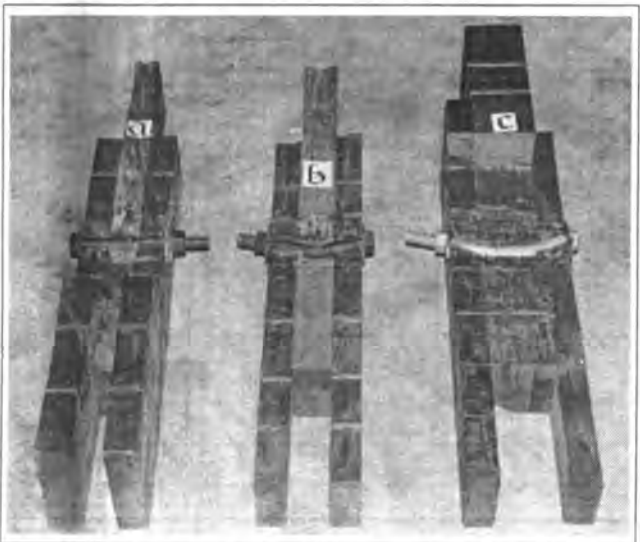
Sectional end elevation of Timber Joints Palu timber and 12.5 mm steel bolts
